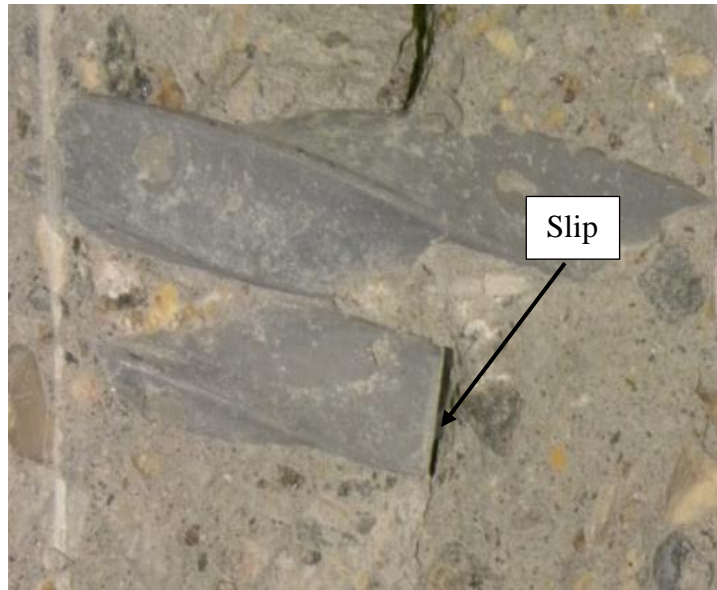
End Slip of Longitudinal Reinforcement Following Concrete Removal for Specimen 25♦-510↓
